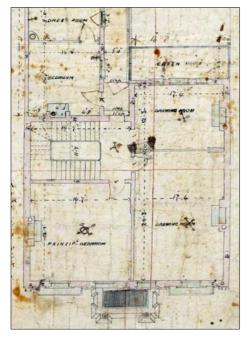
(left) 1873 ground floor plan. Source: Reproduced from the Portland House CMP.
